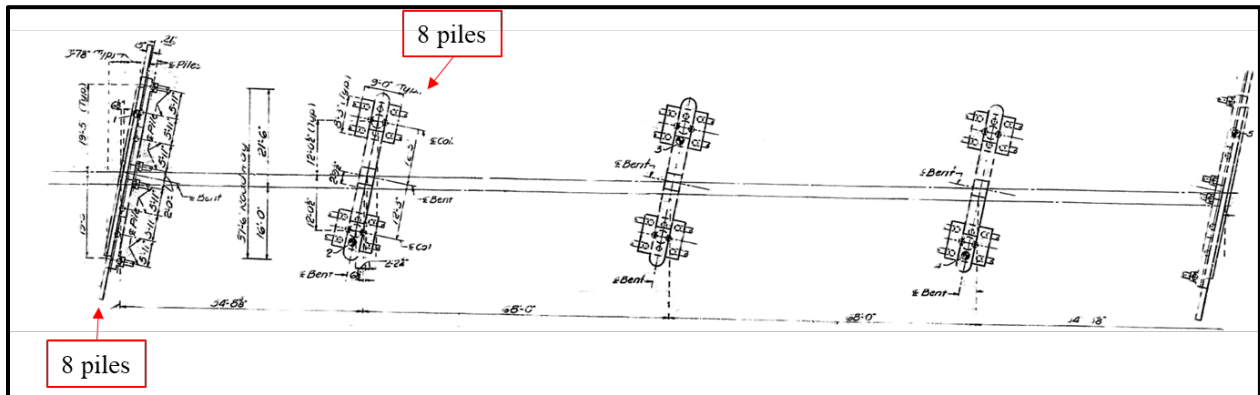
Plan showing foundations (bents and abutments) of the A1466 Bridge
